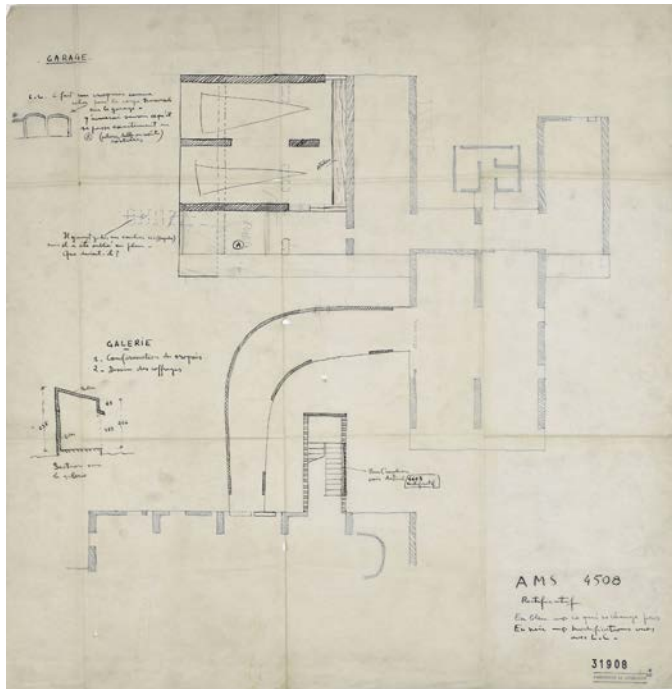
Floor plan sketch of the garage and gallery (FLC 31908).
